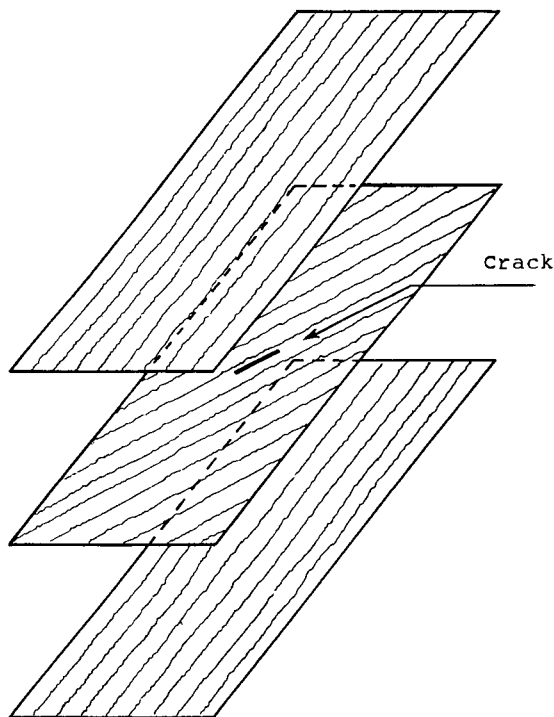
Exploded view of a typical three-layer specimen showing core with sloping grain and a crack.
